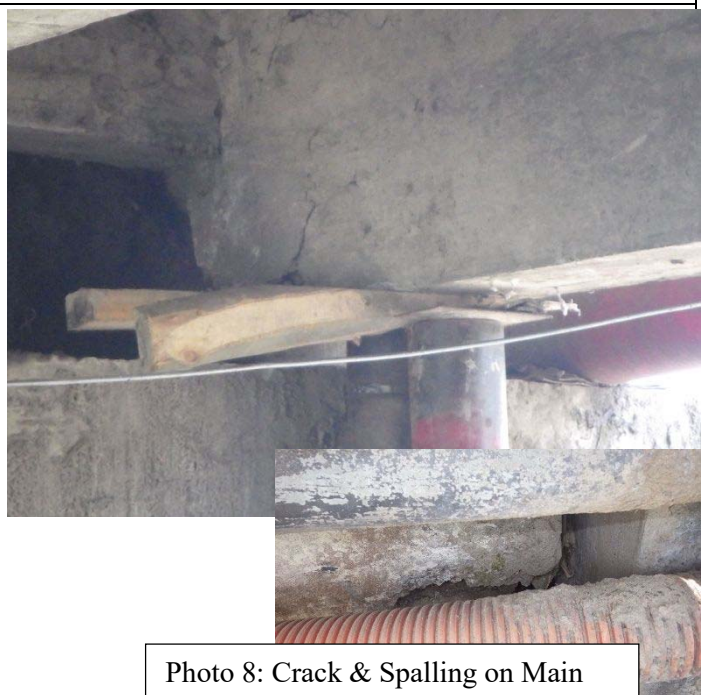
Crack & Spalling on Main Girder (P1, Dhaka end side)
